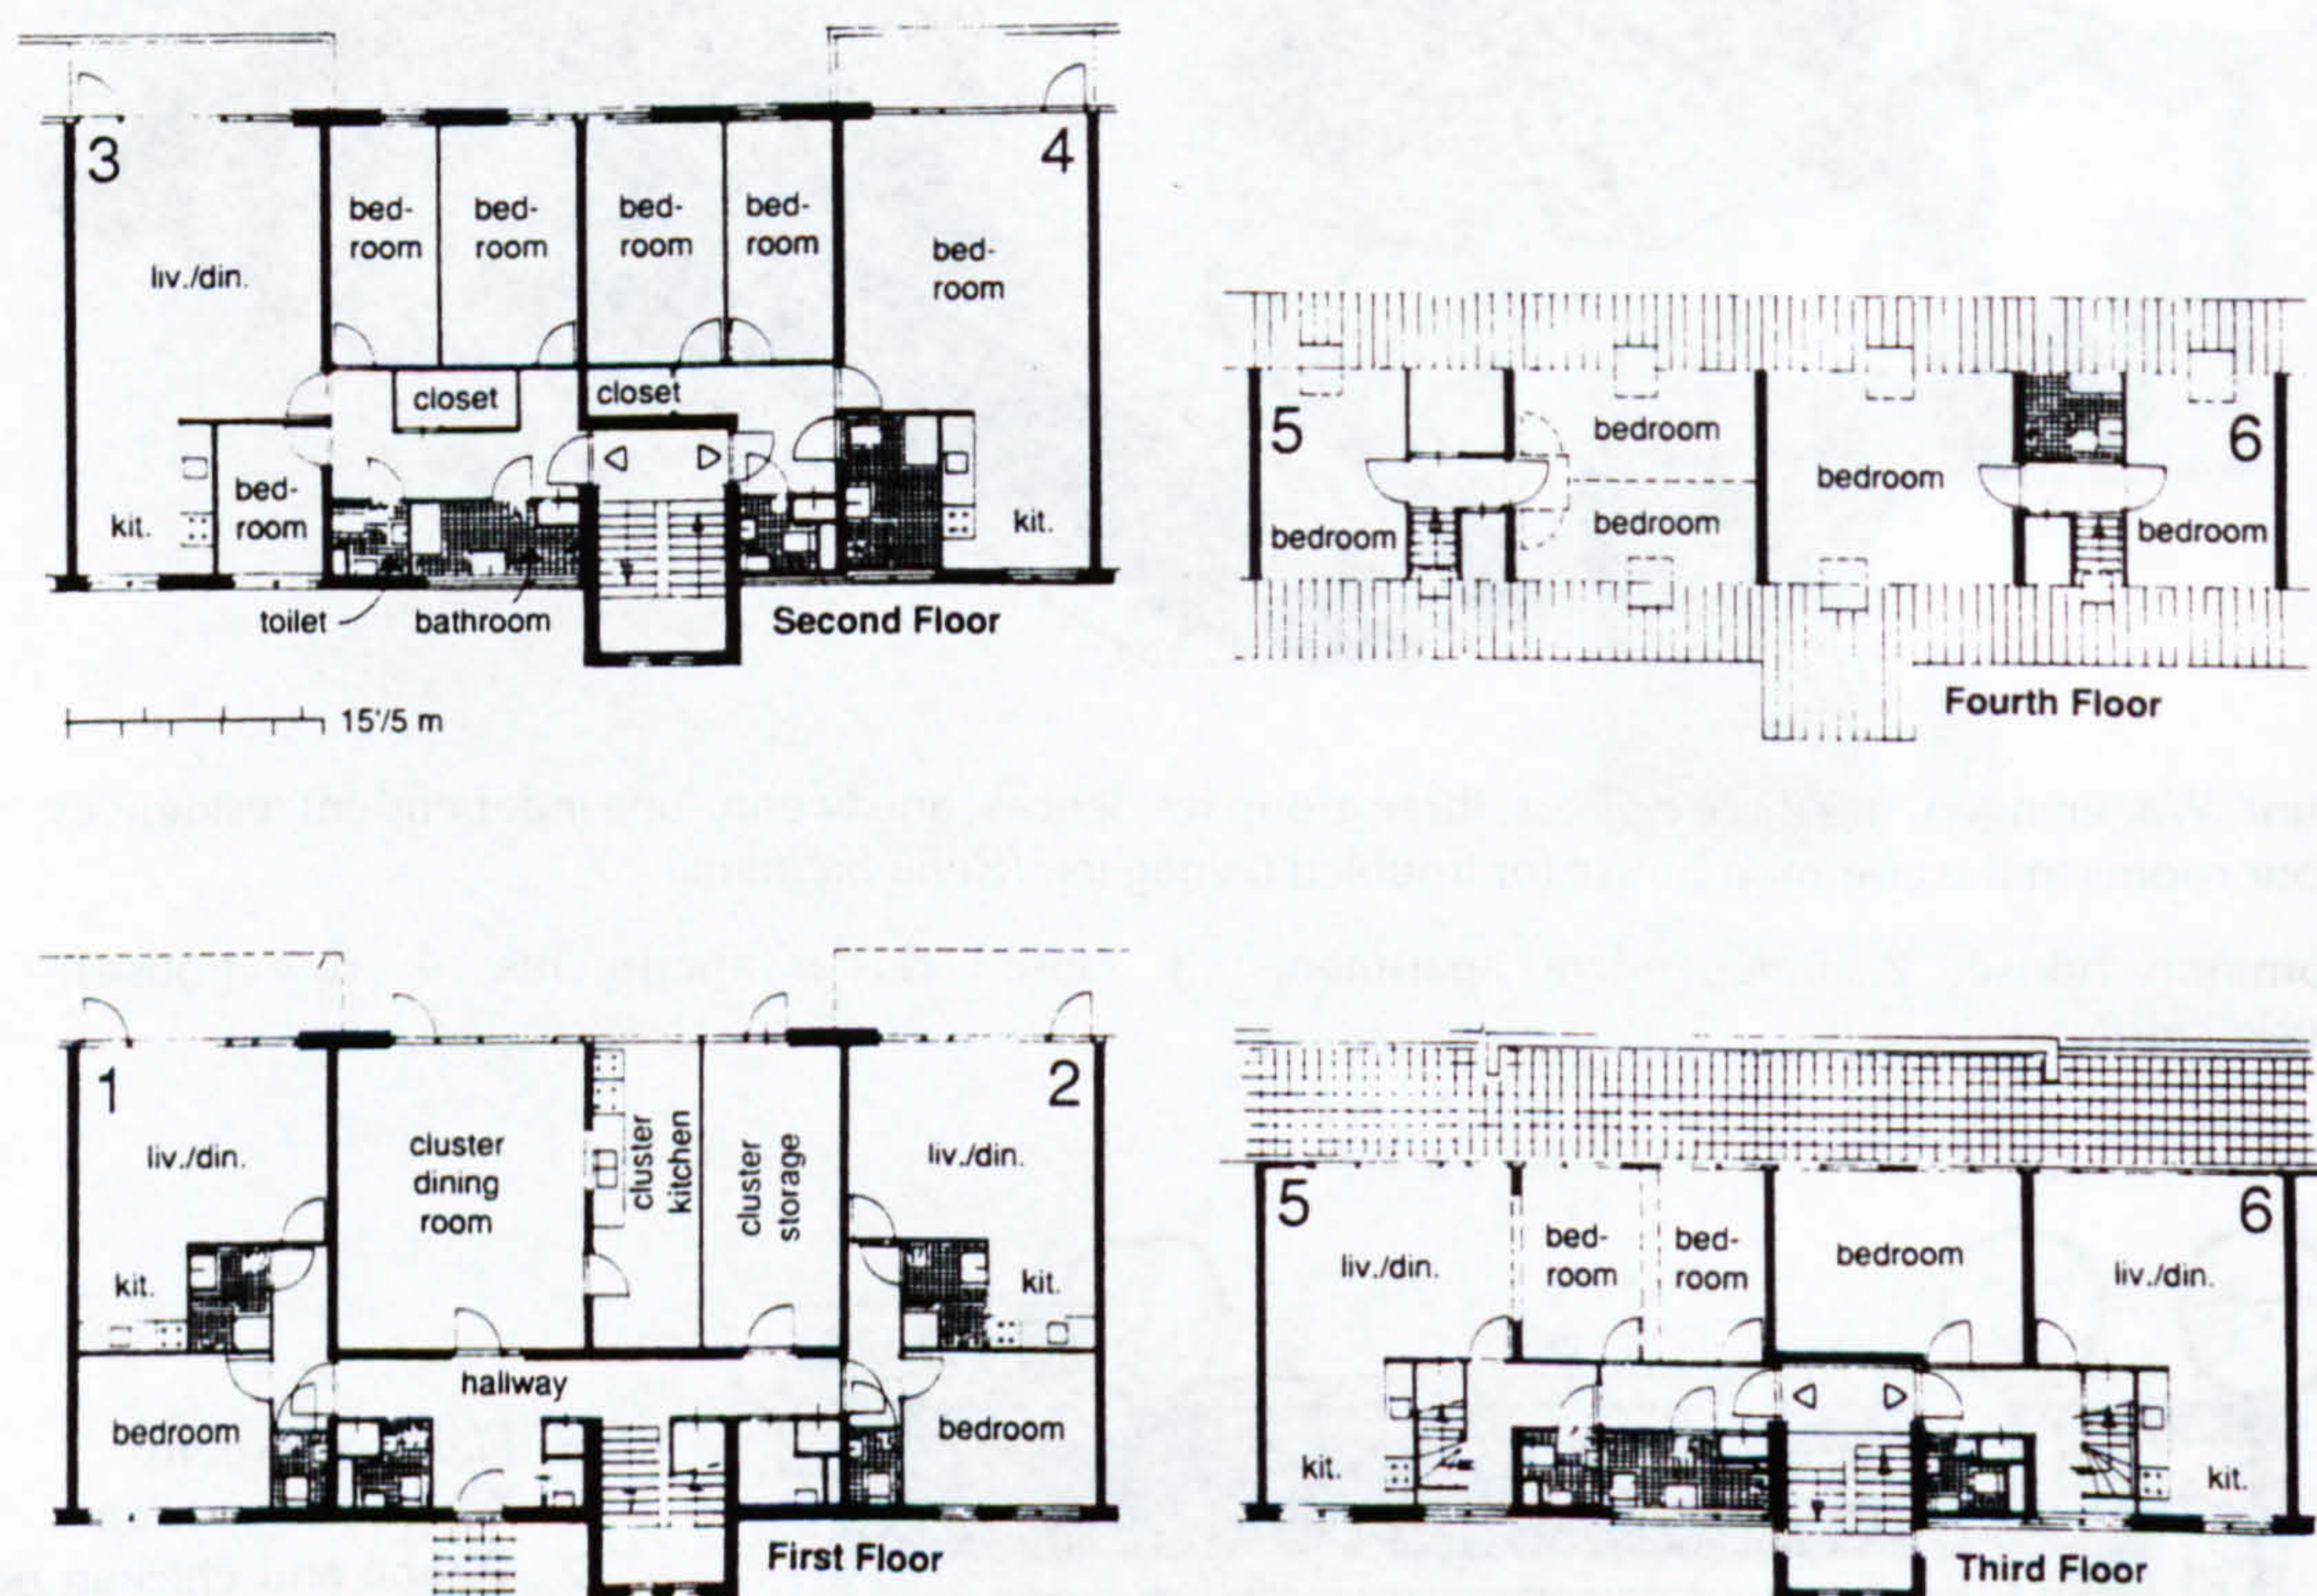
Het Punt: Cluster Floor Plans<sup>119</sup>
